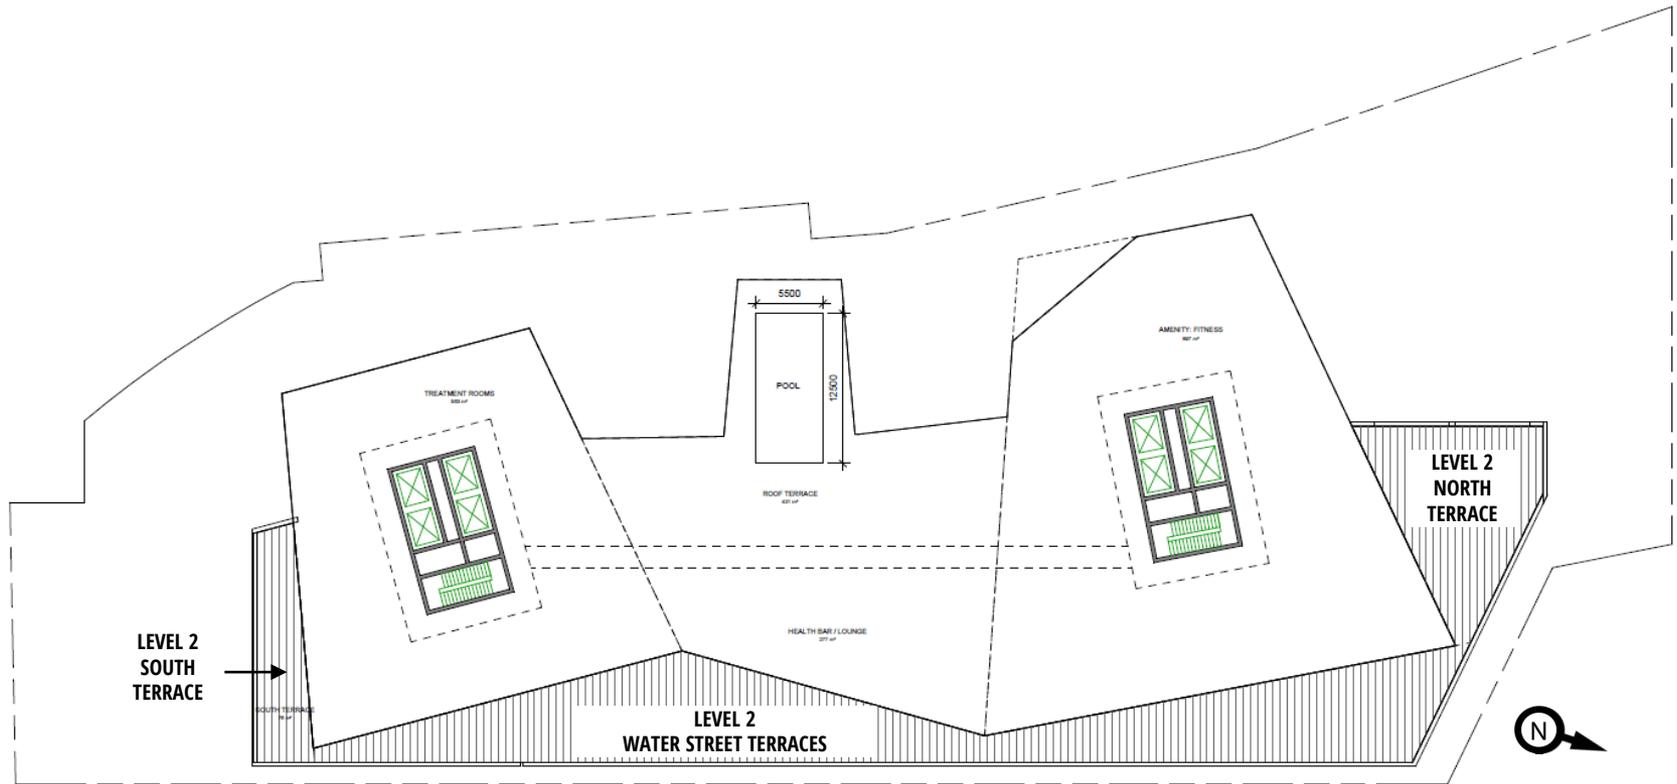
Level 2 Floor Plan (Received September 29, 2020)
